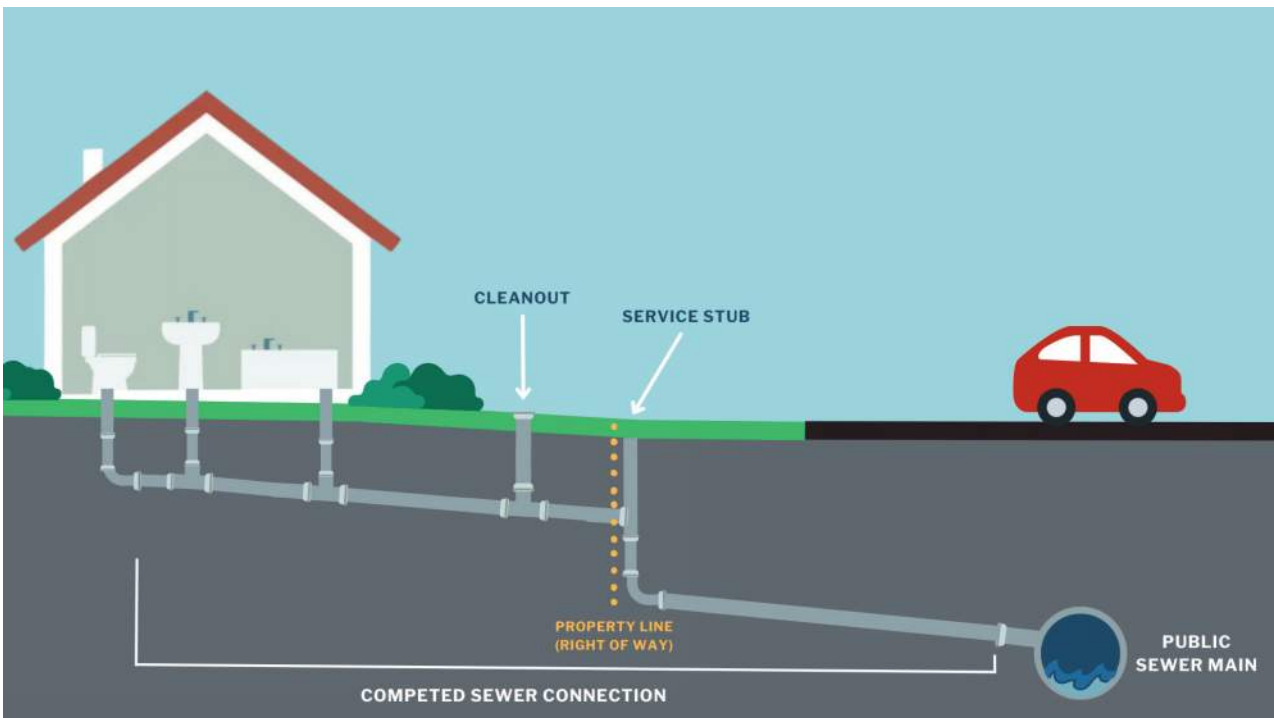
SAMPLE COMPLETED SEWER CONNECTION
